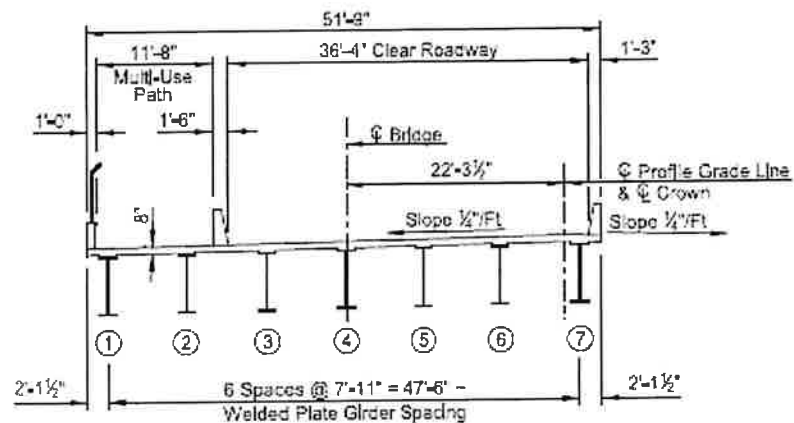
64th Avenue S & I-29 Bridge, Existing Typical Section
